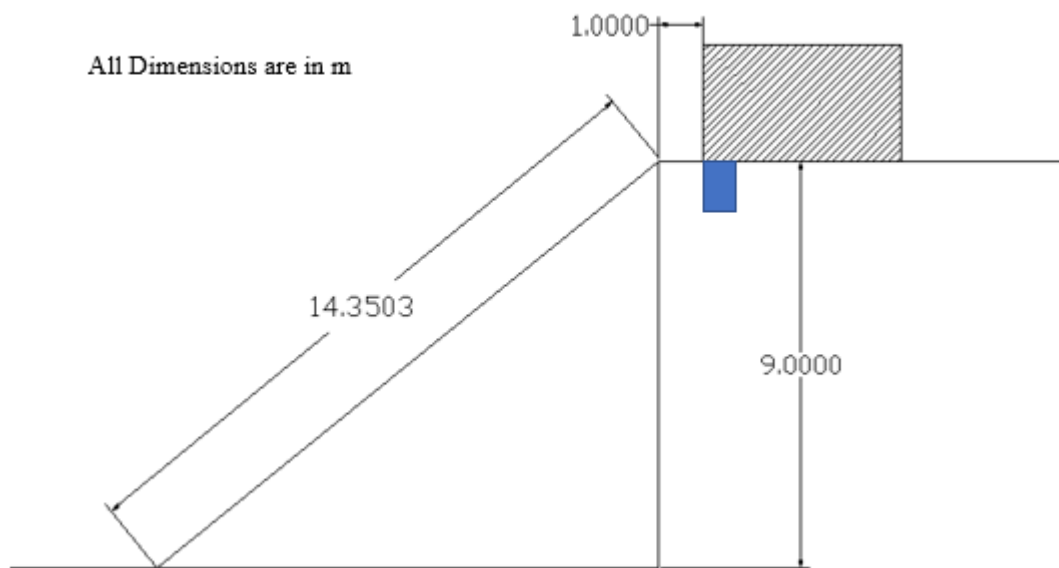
2: Sketch of the Building (Hatched portion) on slope (Dhulikhel-7)
